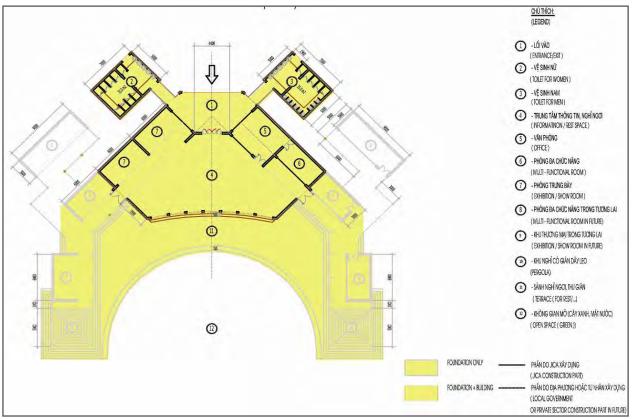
Floor Plan for Michinoeki Pilot Project
